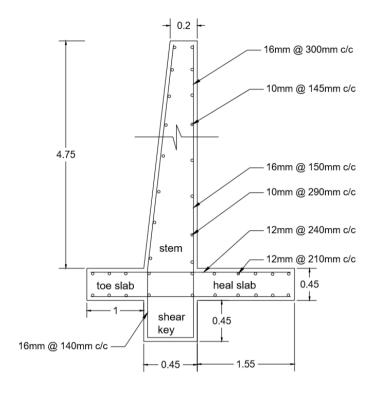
Cantilever retaining wall (Reinforcement details cross section)
